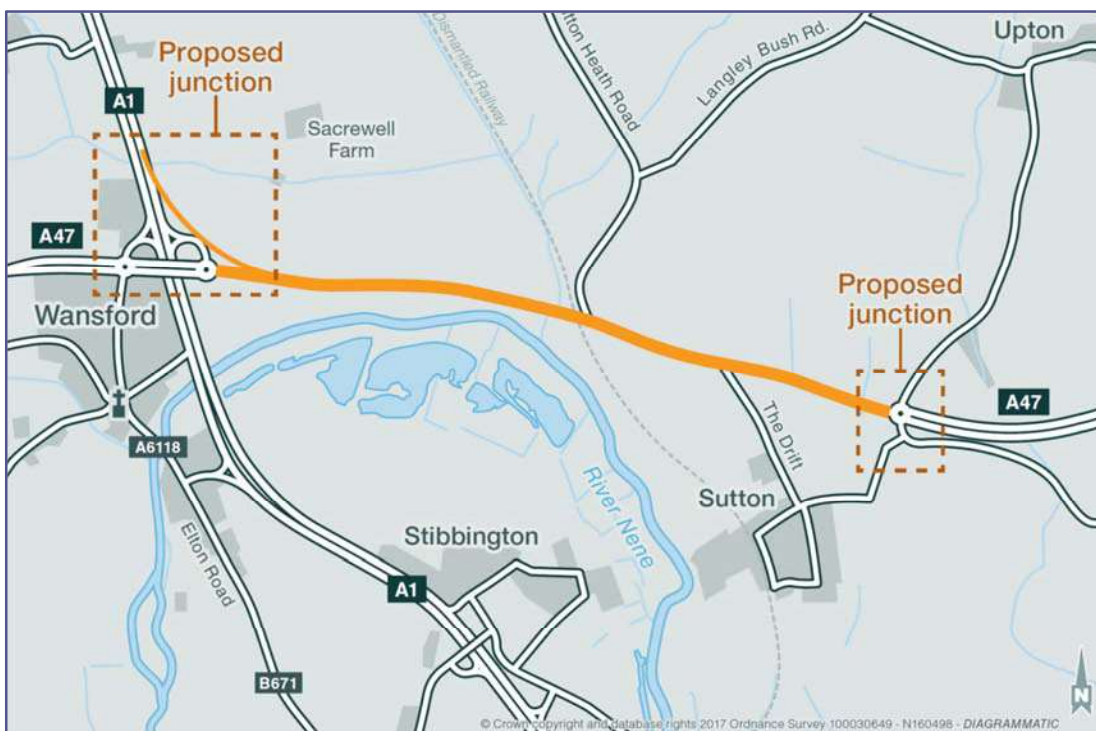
Highways England Route Option 1 – Construction on the Existing Alignment
